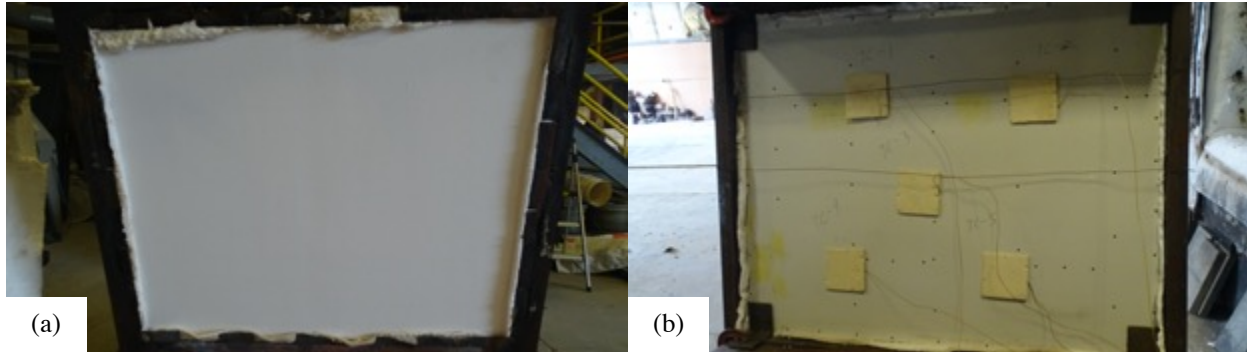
Test 2 assembly showing (a) exposed coating and (b) unexposed gypsum.
